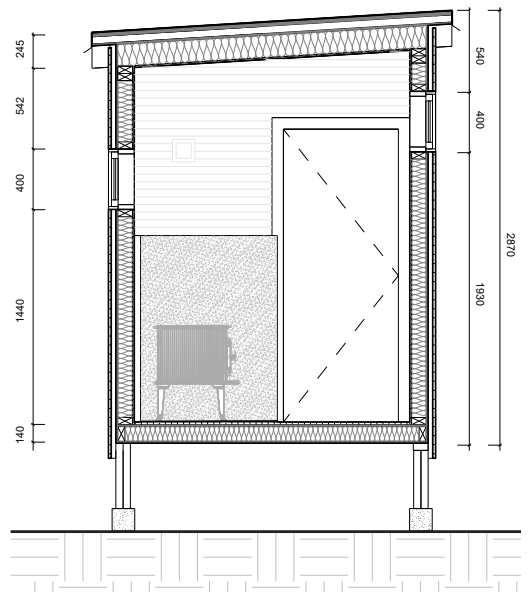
SECTION D-D OF THE BUILT CABIN.
